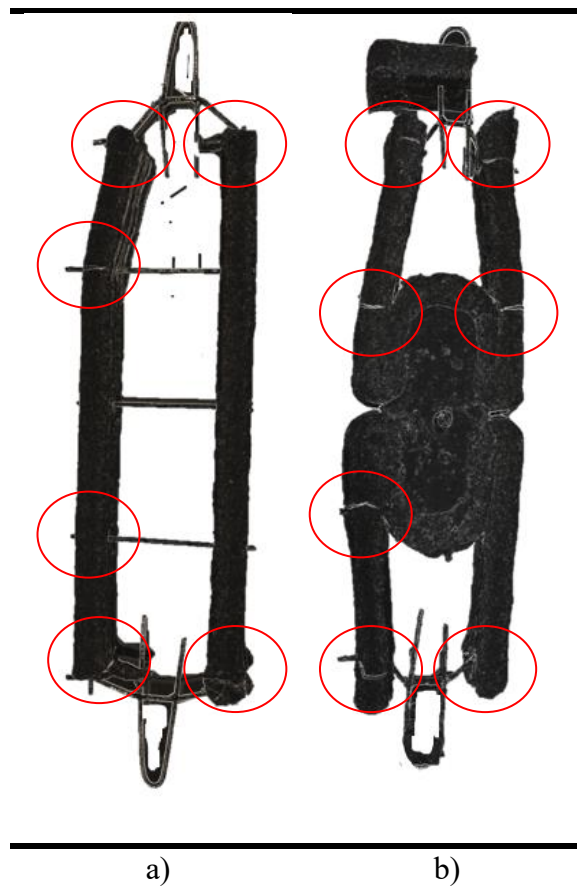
Typical failure patterns of a) MW specimen, b) MoDW specimen.
